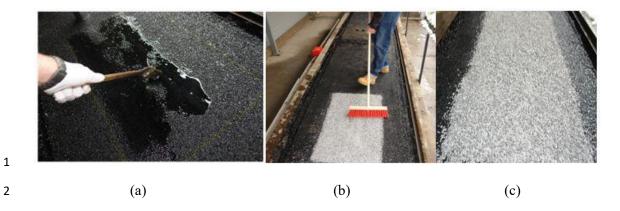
Application of the epoxy resin and spreading material: (a) application of epoxy resin; (b) application of spreading materials and removal of excess aggregate; (c) final asphalt pavement surface treated with spreading material
